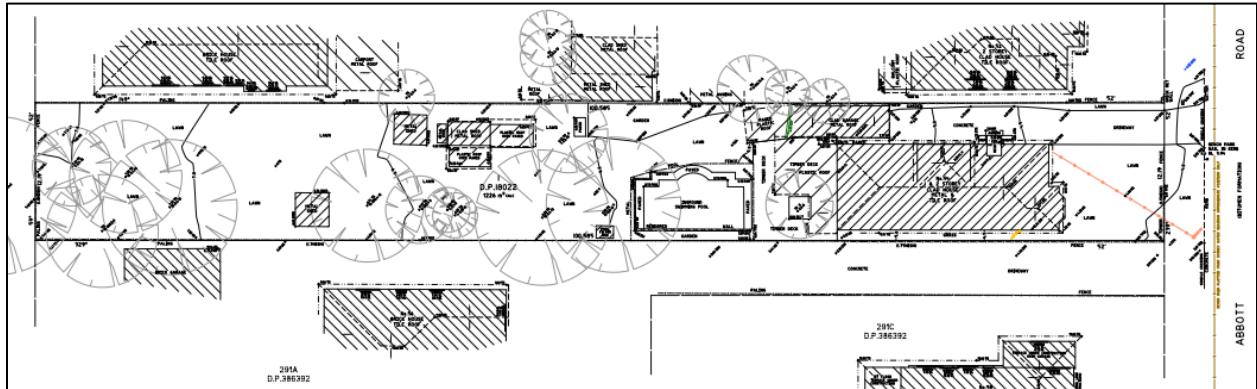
Pre-Developed Site Plan (Source: C.M.S Surveyors Pty Ltd)
